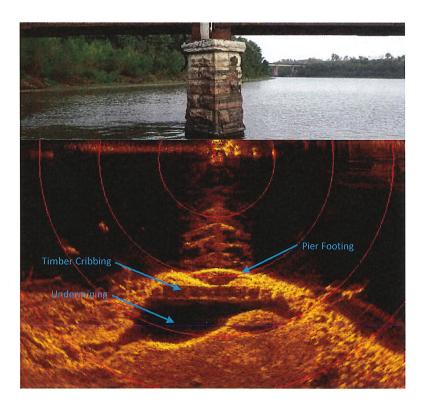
Pier 22 – South face Note: Exposed footing, timber cribbing, and subsequent undermining
